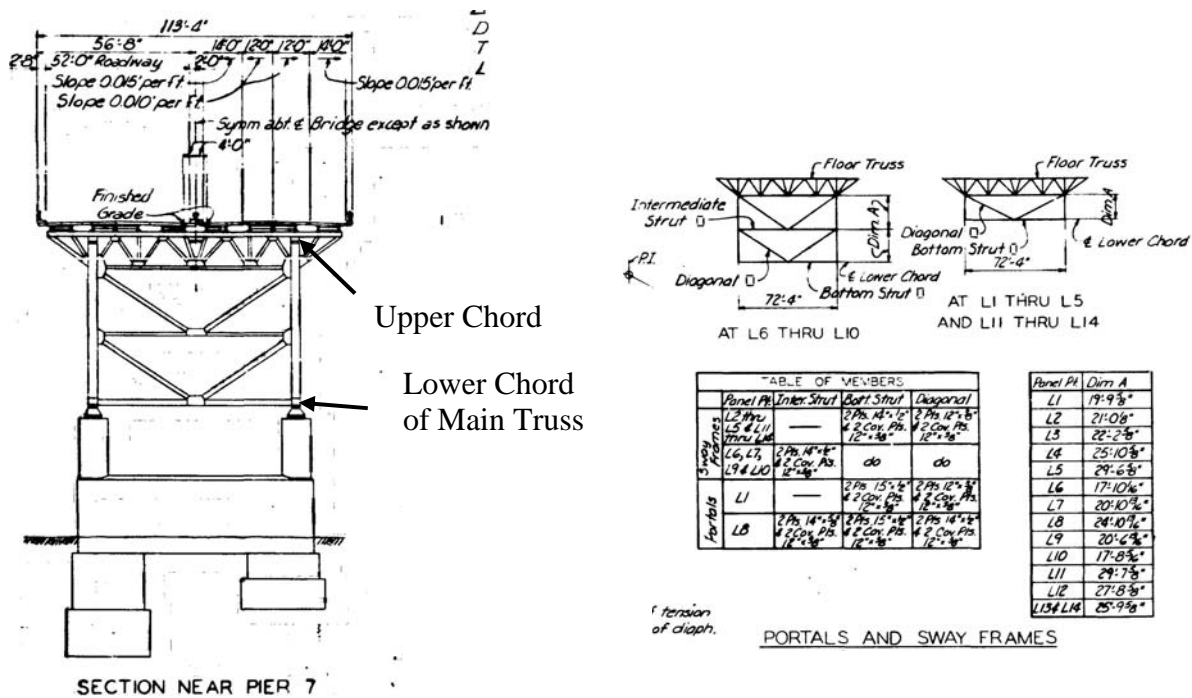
Section view and sway frames (from Mn/DOT 2008).
